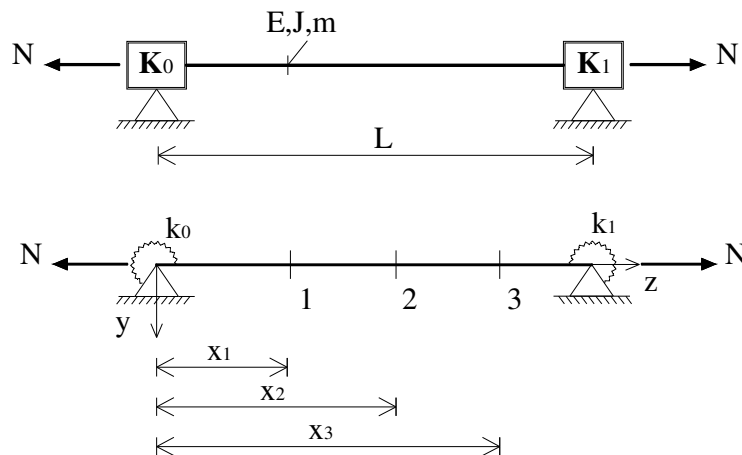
Beam with end flexural constraints and location of the instrumented sections
